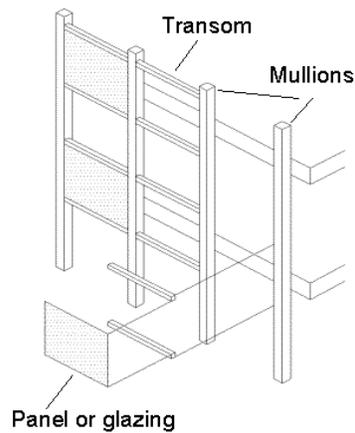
Example of stick system (Center of Window and Cladding Technology [online]. (n.d.). from. <http://www.cwct.co.uk/facets/pack03/0101.htm> [Accessed at November 2006.]
